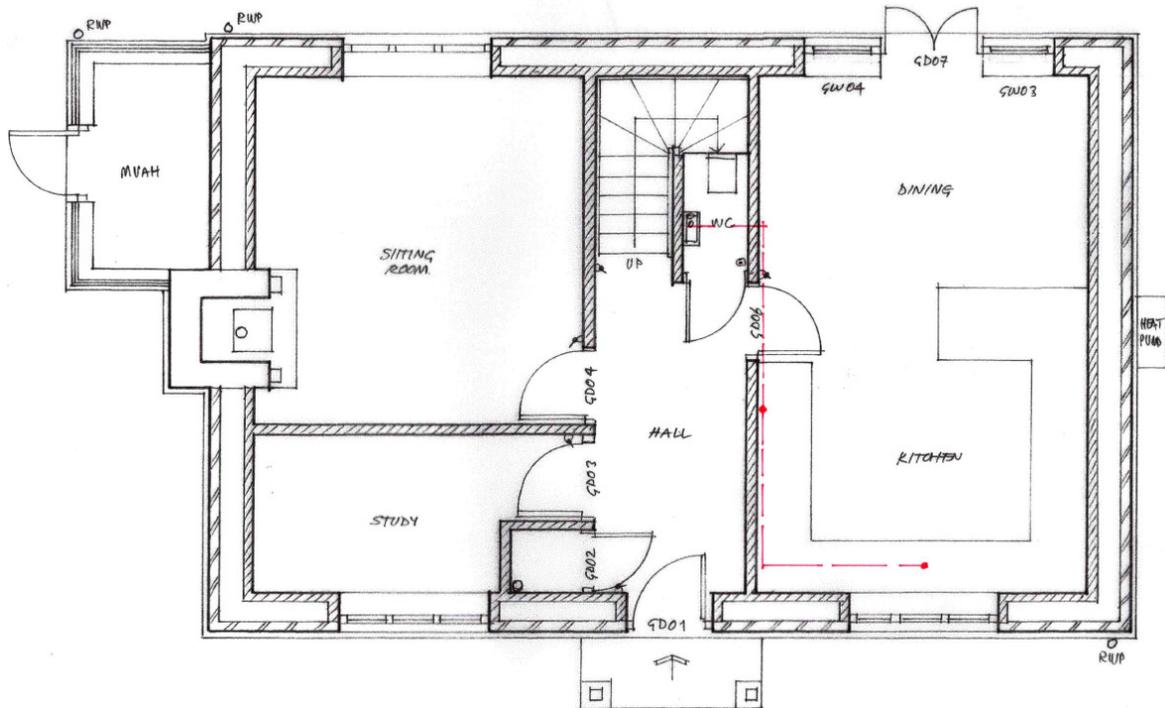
Ground Floor Plan. Drawing by Lacey Interior Architecture Ltd.
